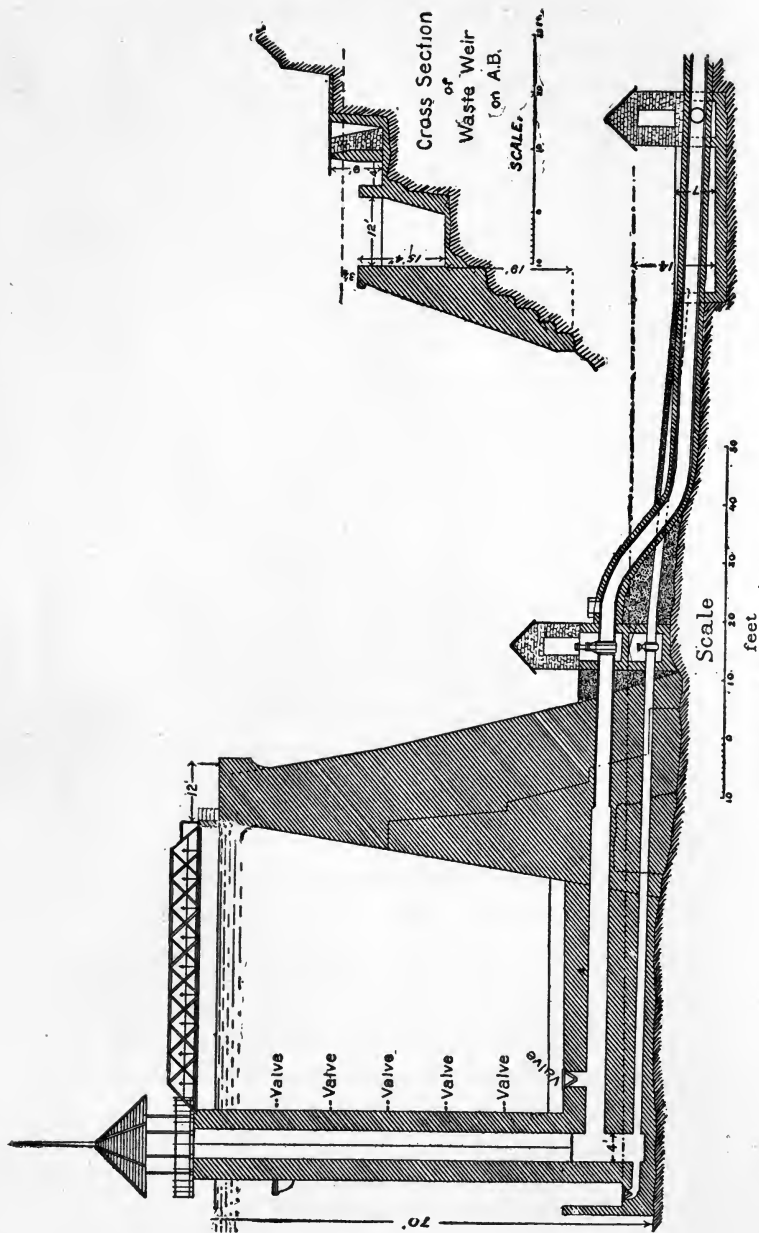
PLATE XXV.—CROSS-SECTION OF SWEETWATER DAM.
